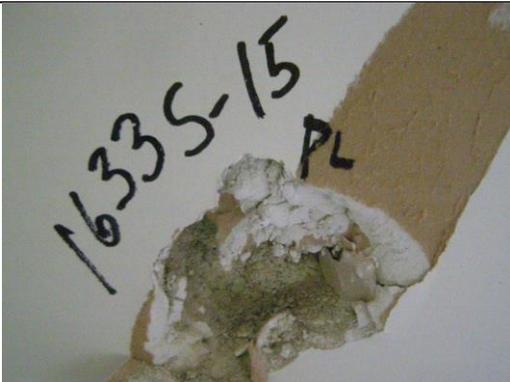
Plaster (1633S-15) Bedroom 1, Wall A. No Asbestos Detected.
